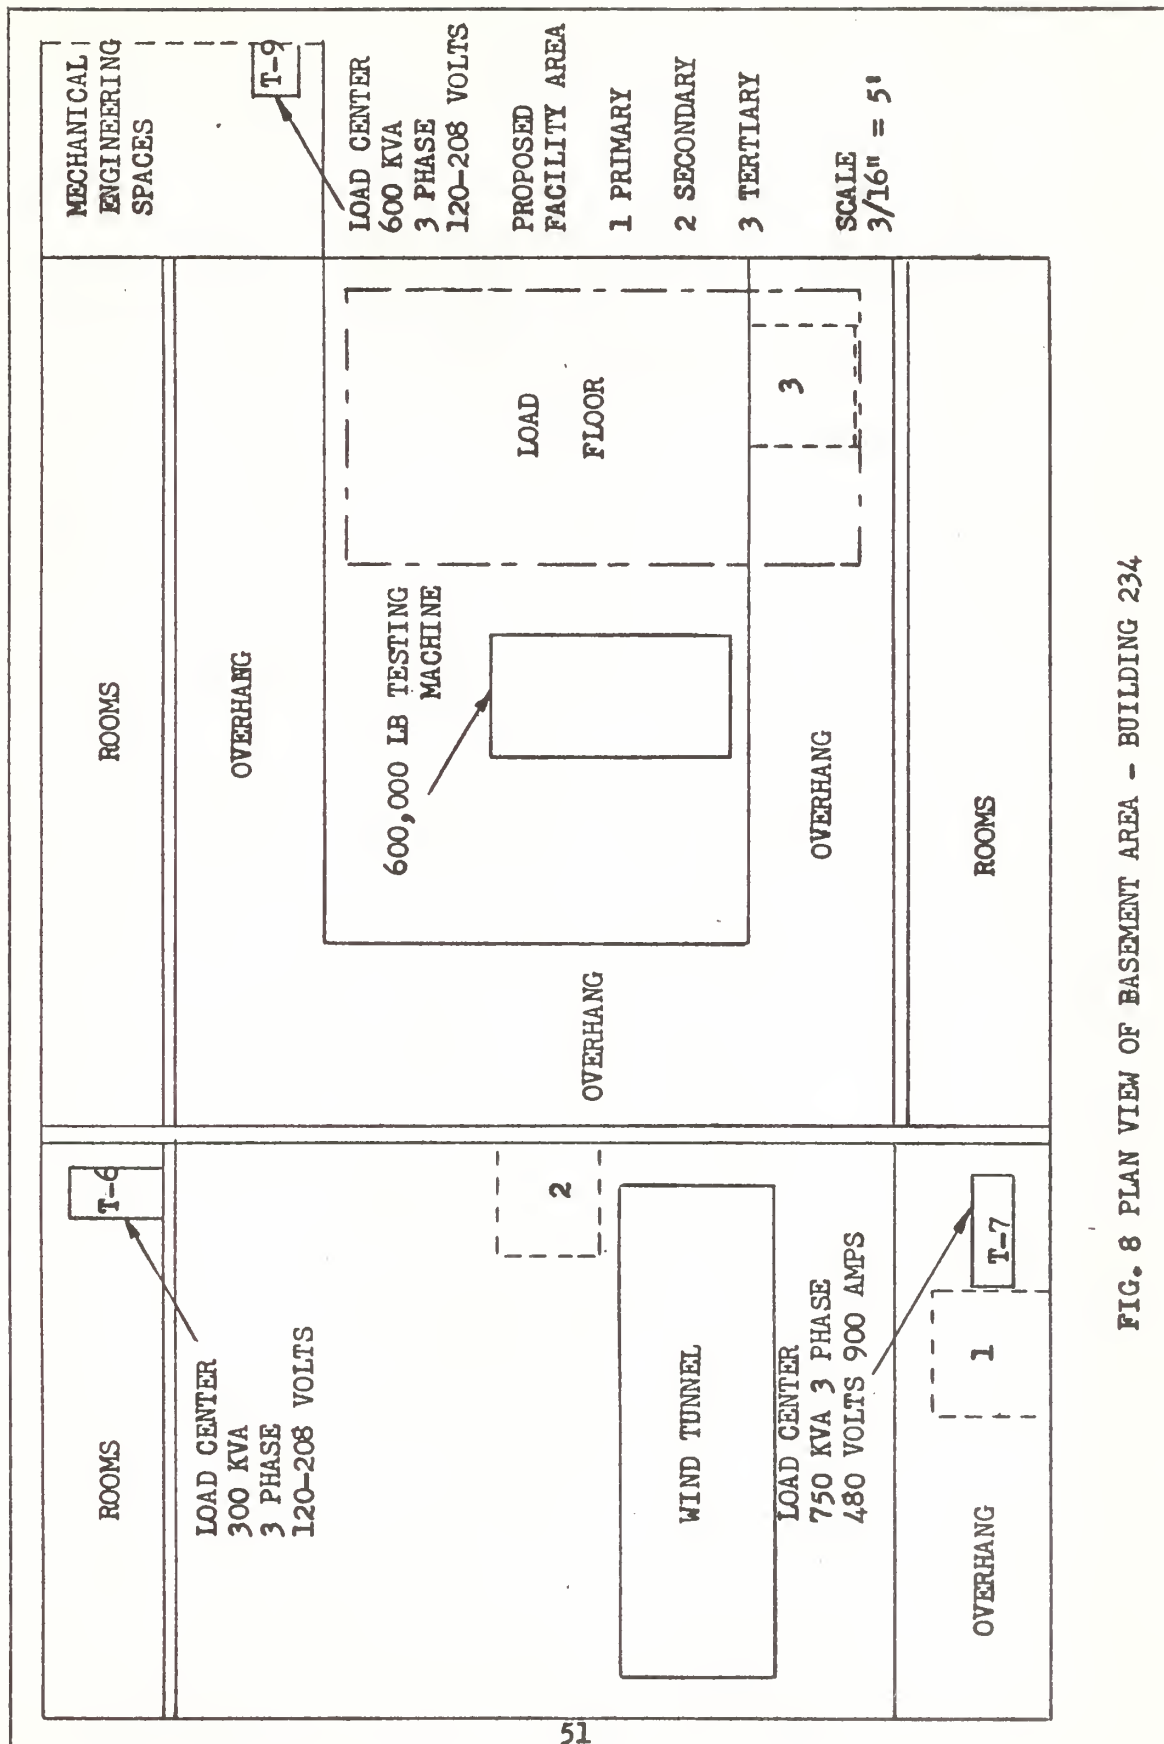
PLAN VIEW OF BASEMENT AREA - BUILDING 234
